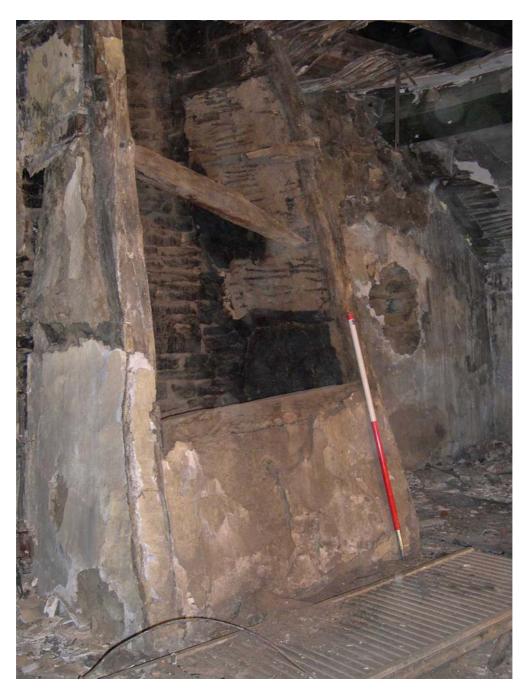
North side of firehood in first floor Room ${\bf 1}$
